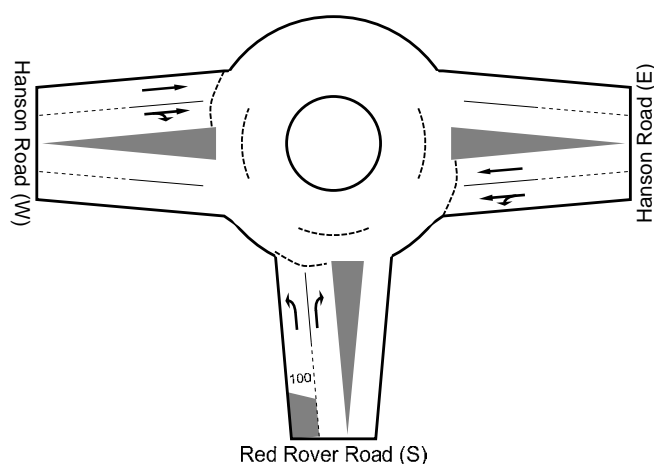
Altered Hanson Road/ Red Rover Road intersection
